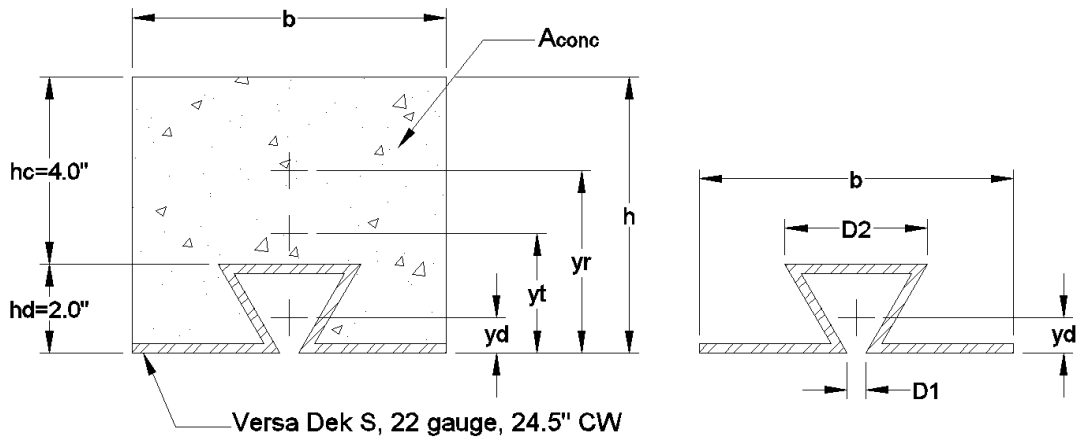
Bay 5, Slab Cross Section and Deck Geometry
